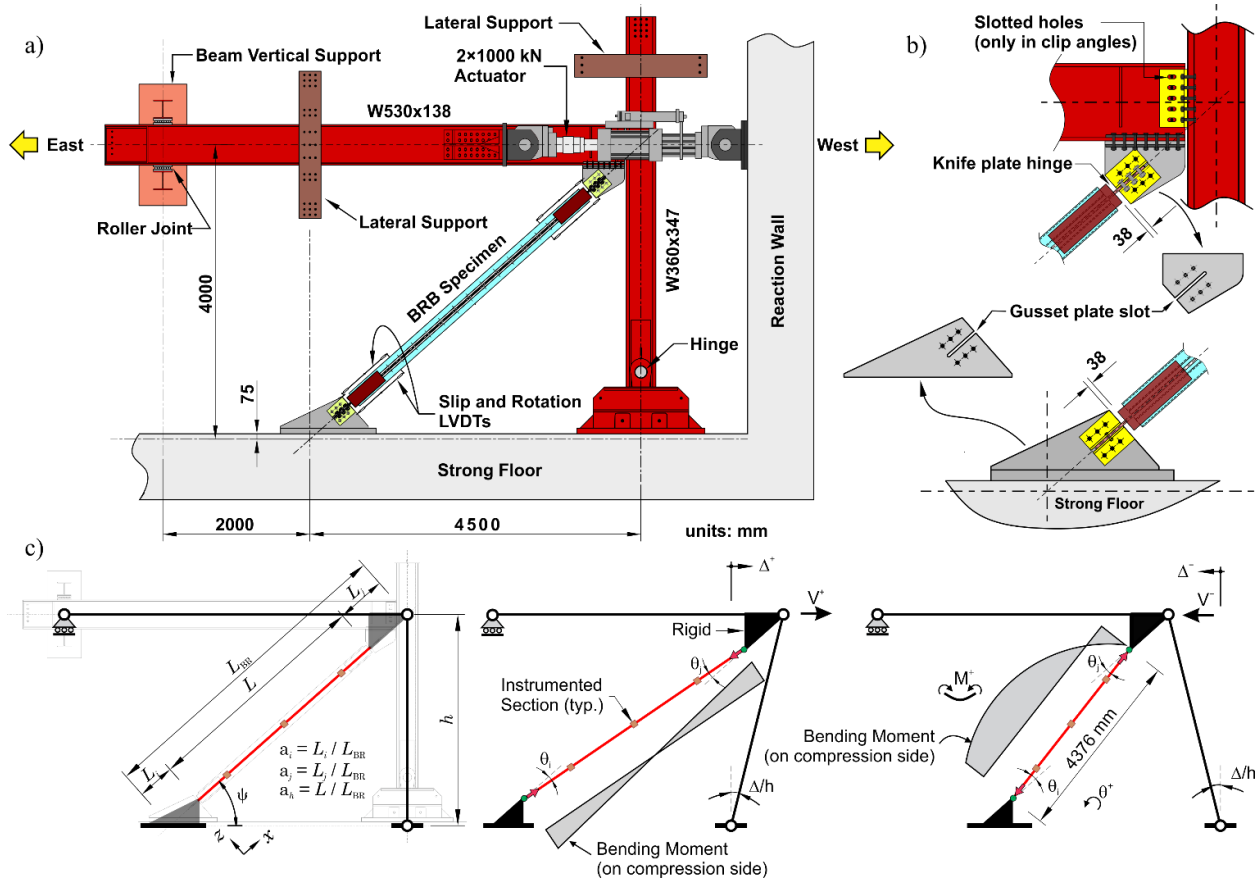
a) Elevation of the test setup; b) Beam-brace-column joint, and top and bottom gusset plates prior to connecting the BRB specimens; c) End rotations and bending moment demand induced by storey drifts.
